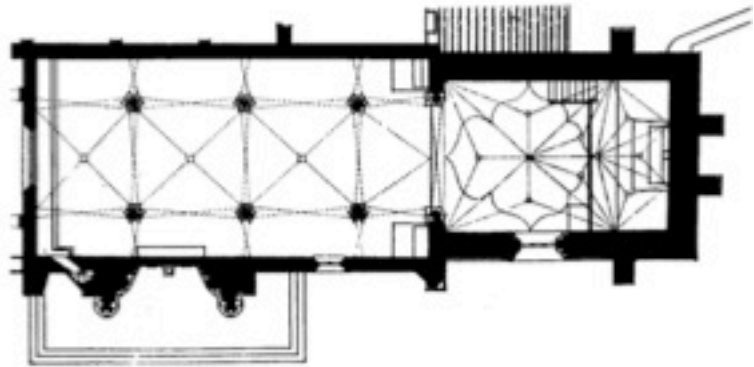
Section Plan of the Jesus Church, Setubal, Portugal
